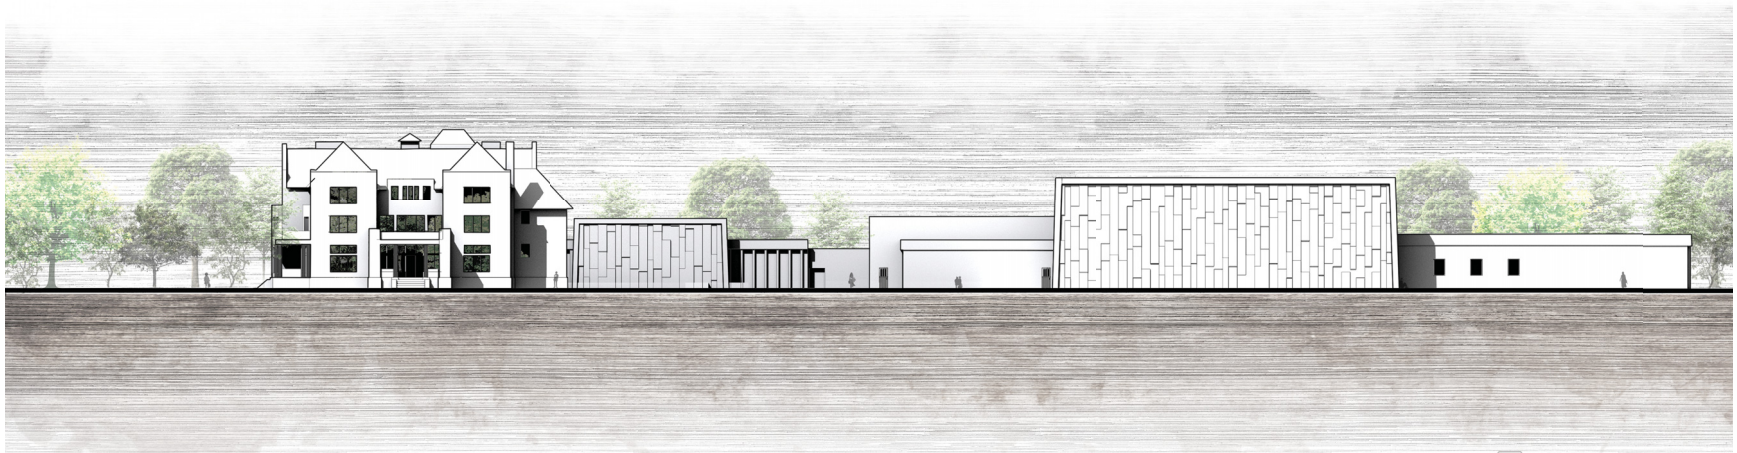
1:700 Existing East Elevations of the Royal Alberta Museum
